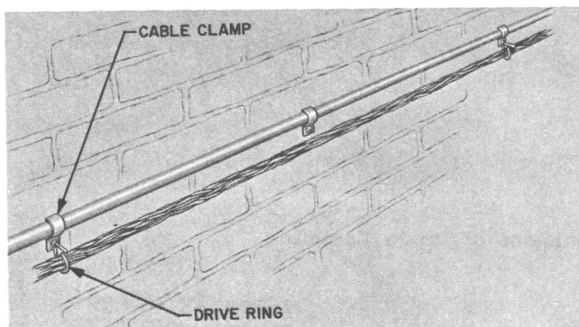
Drive Ring or Bridle Ring Run Paralleling Cable Attached with Cable Clamps
